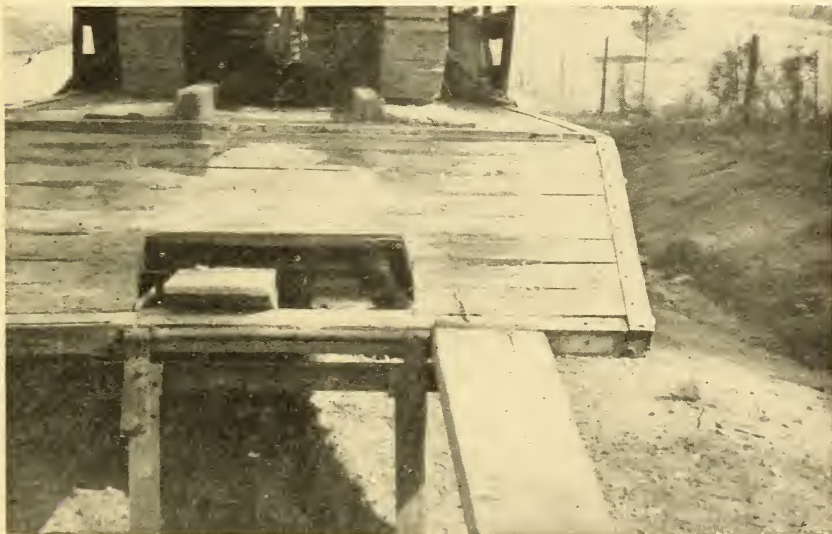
Stiff leg in position. Rollers make it easy to pull out run planks.
